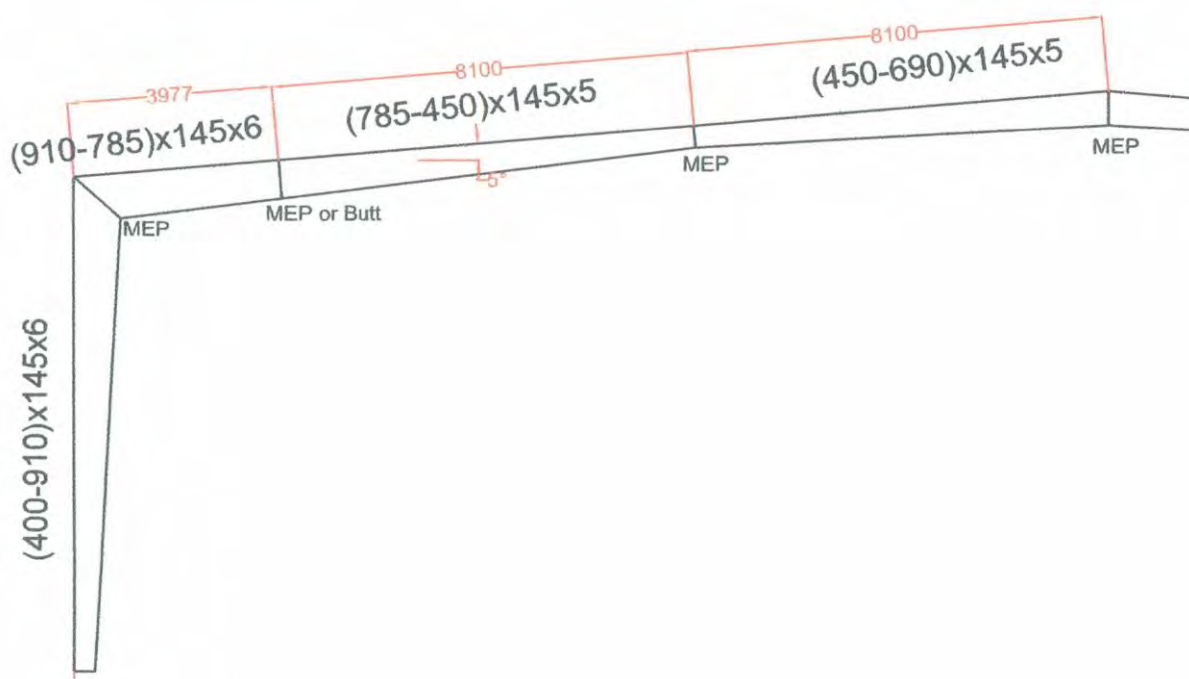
Elevation of half of the main portal frame showing the tapered box beam. Design courtesy of Steltech NZ.
